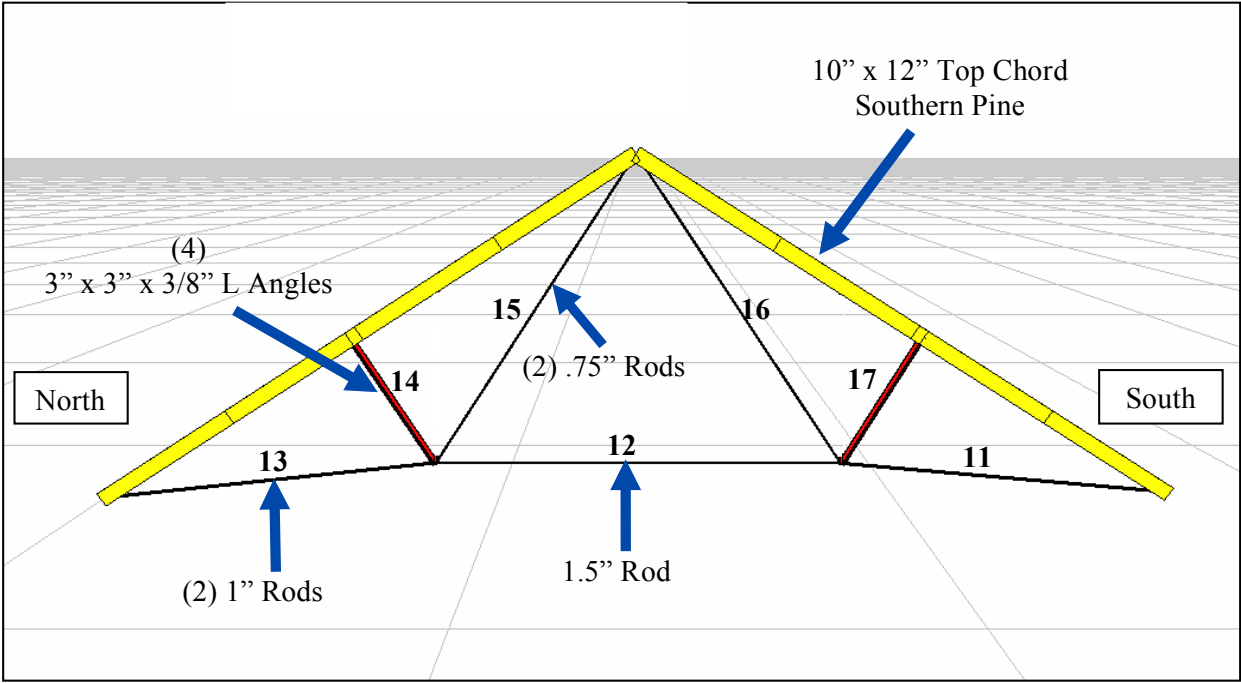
Layout of principal truss used throughout most of the Breeding Barn
